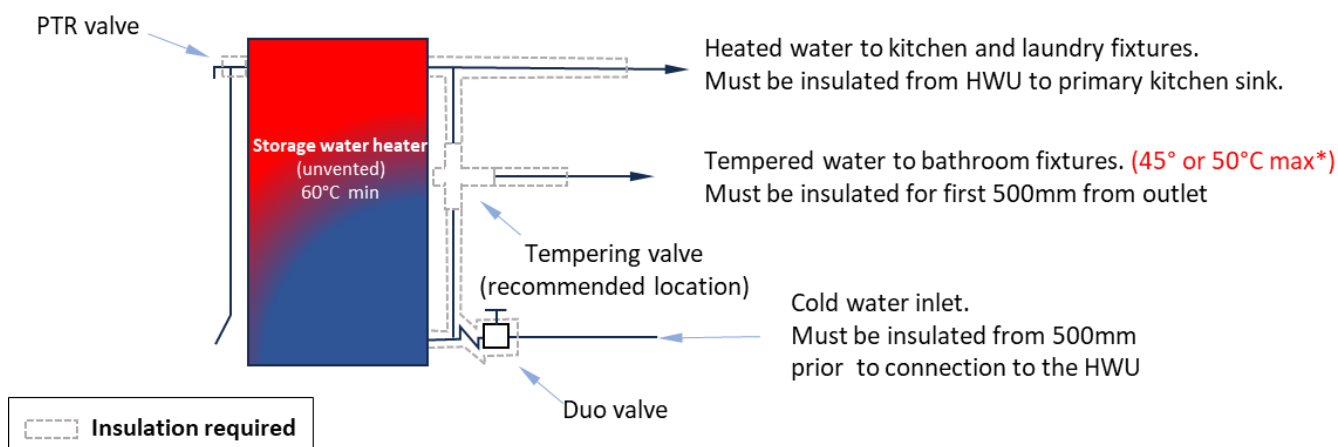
Typical (recommended) installation of a storage water heater with a tempering valve and pipework insulation.
